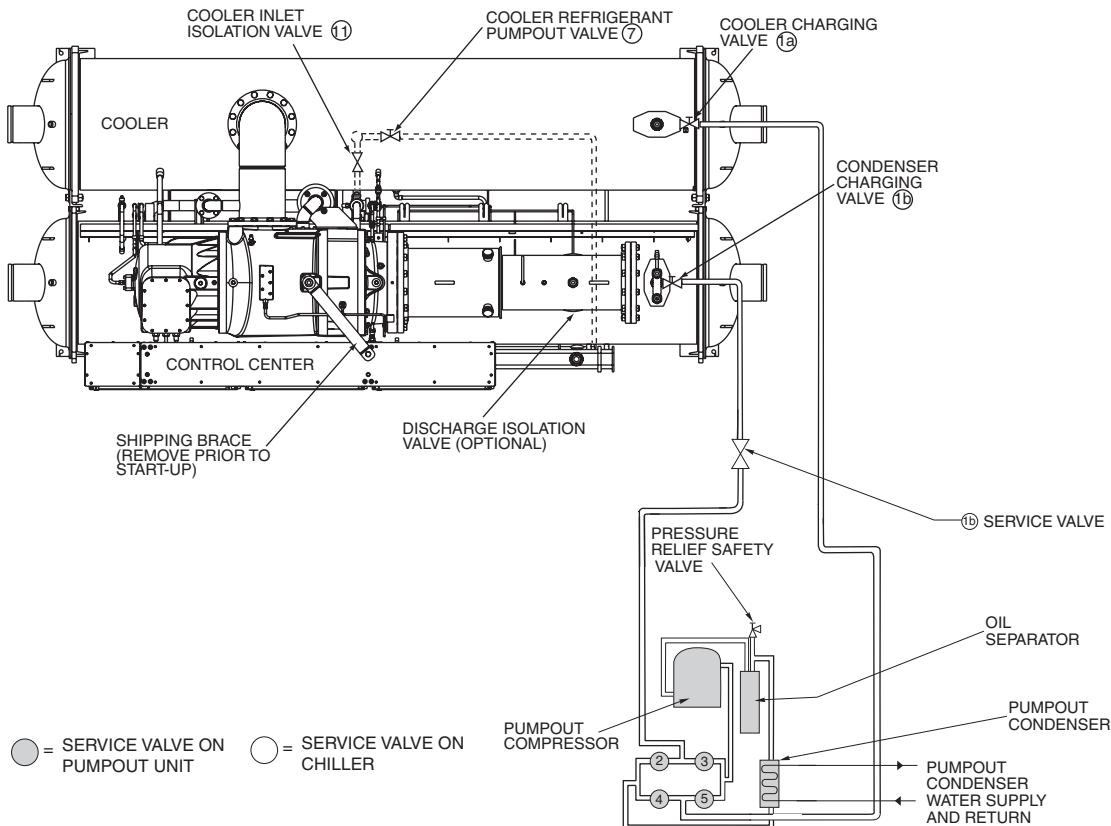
Optional Pumpout System Piping Schematic without Storage Tank — Configured to Store Refrigerant in Cooler or Condenser (Unit with R Compressor Shown)
